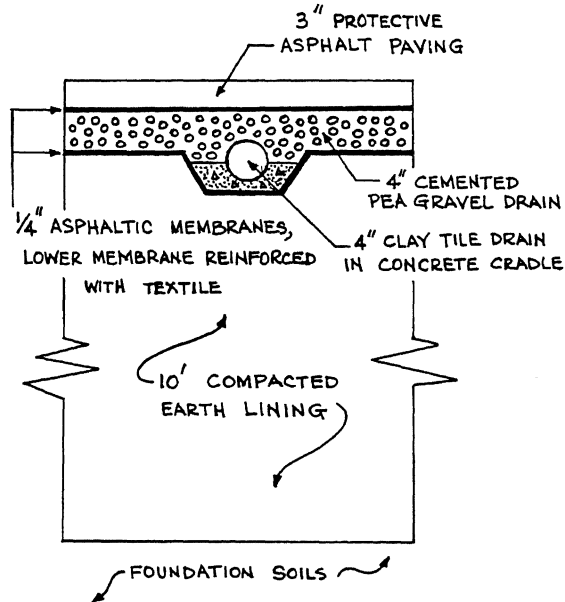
Proposed Sandwich Construction for the Reservoir Lining
